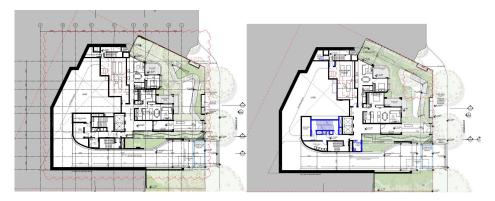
Ground level plan previously approved (left) and proposed (right)
